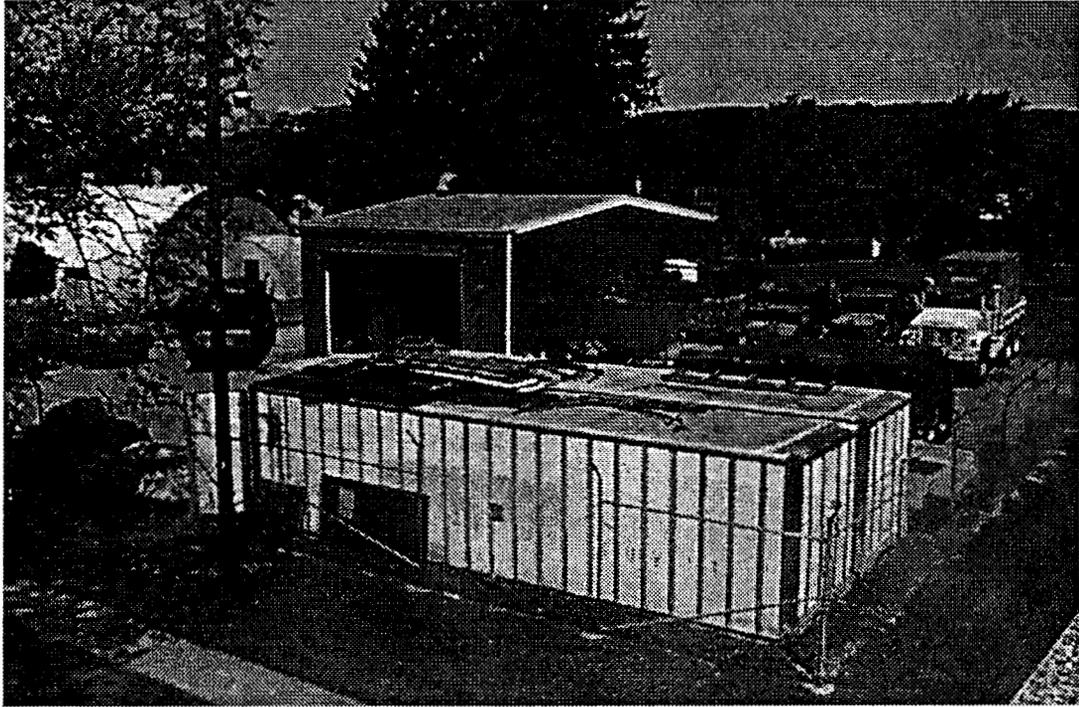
South and East elevations of OMSand MEP. Quonset hut to west is American Legion building.
